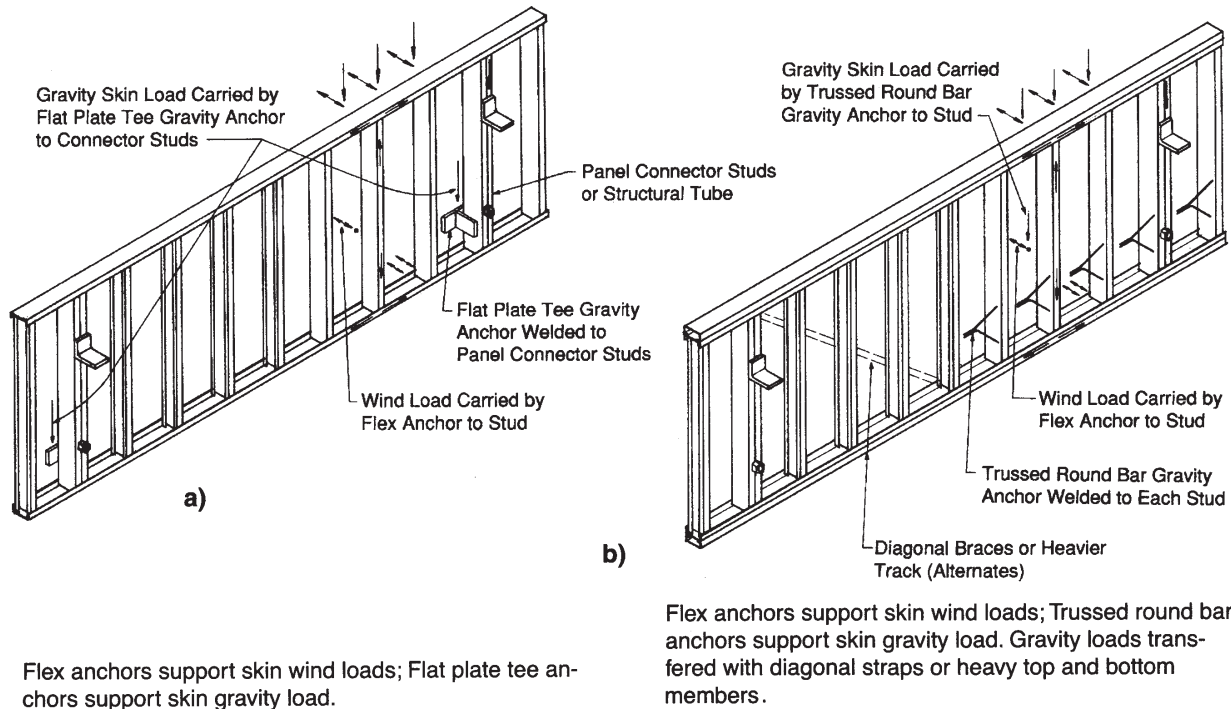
Gravity anchor and panel framing systems. (Taken from Glass Fiber Reinforced Concrete Panels, Fourth Edition, PCI. Used with permission, Precast/Prestressed Concrete Institute.)
